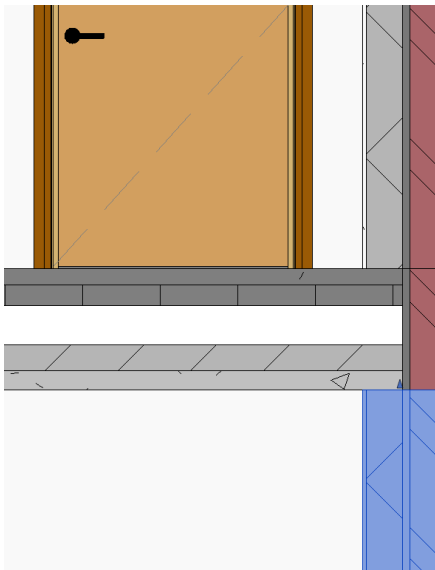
External wall with the right height to avoid overlapping with the floor.
